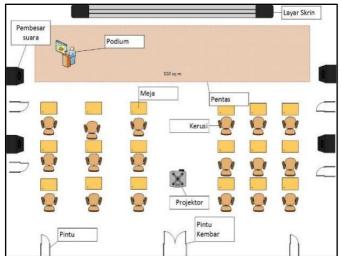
Floor Plan Design in Dewan Sri Mutiara, PSP
